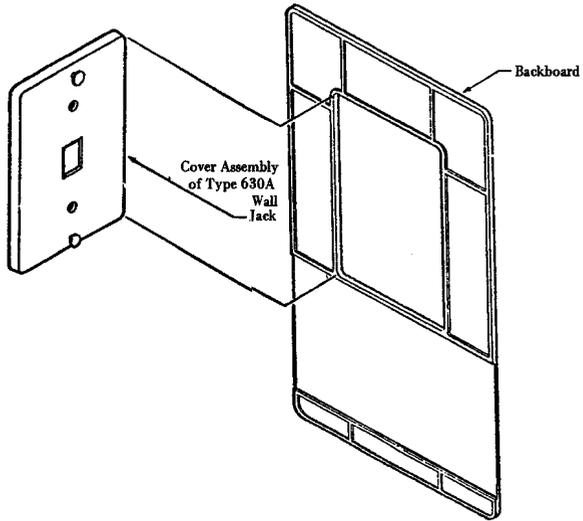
Backboard Installation Around a 630A Wall Jack
